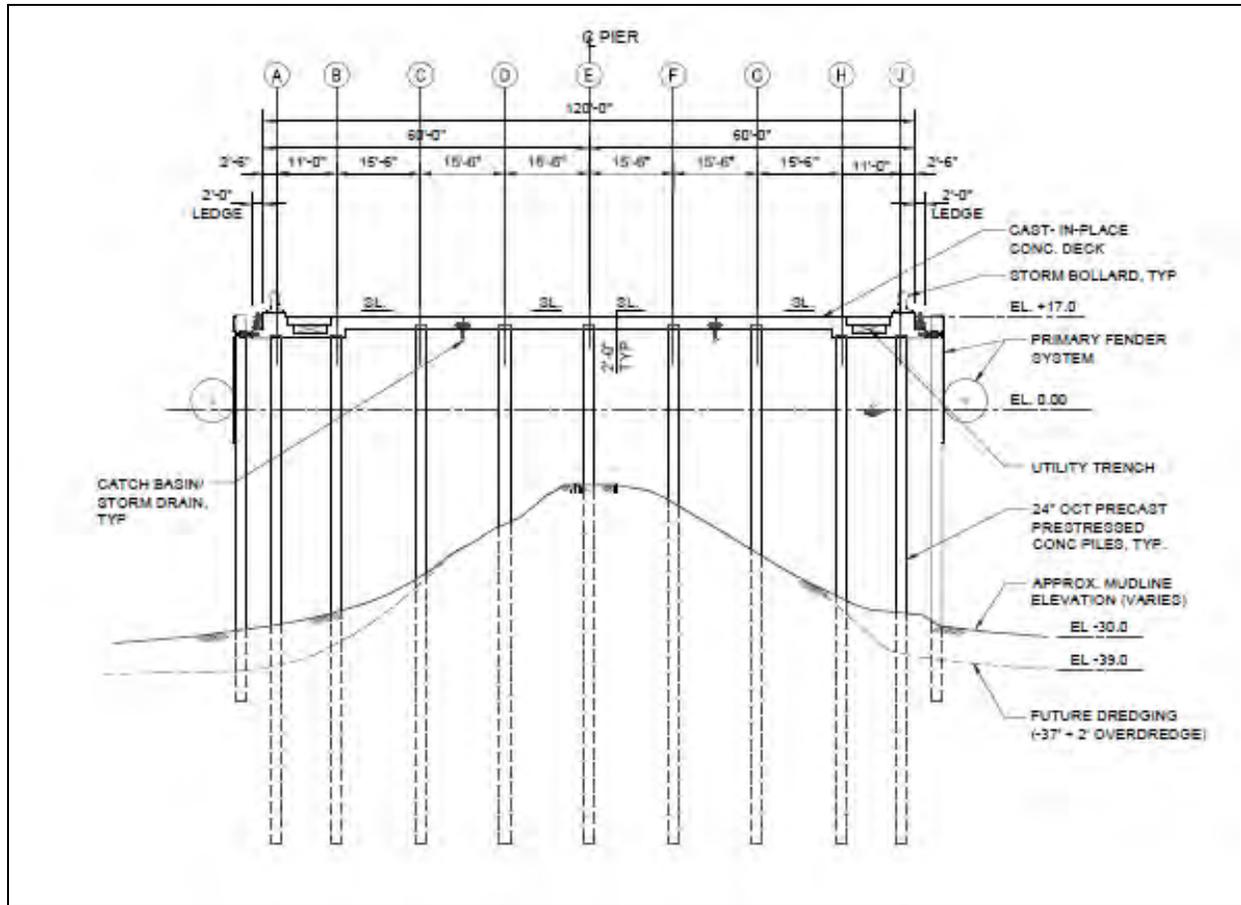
Cross-Section of Proposed Pier 6 (typical)
